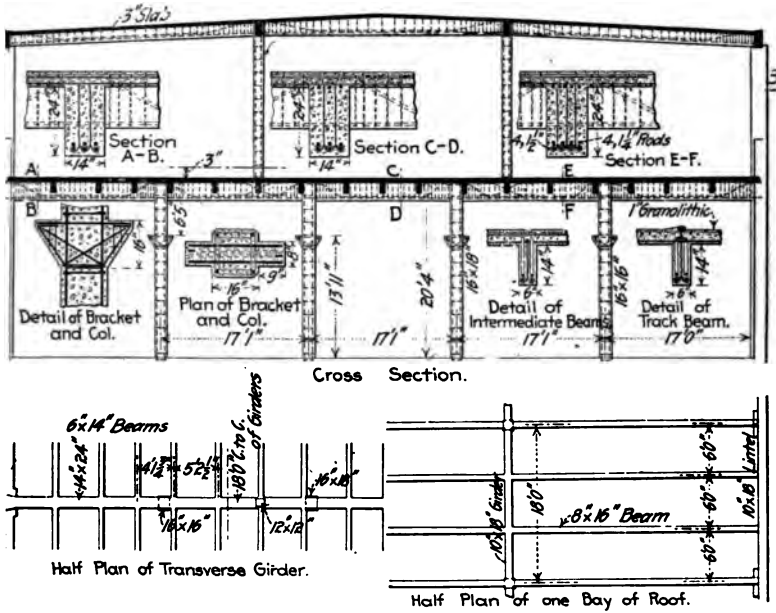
Transverse Section, Overhauling Shop, Philadelphia Rapid Transit Co.
